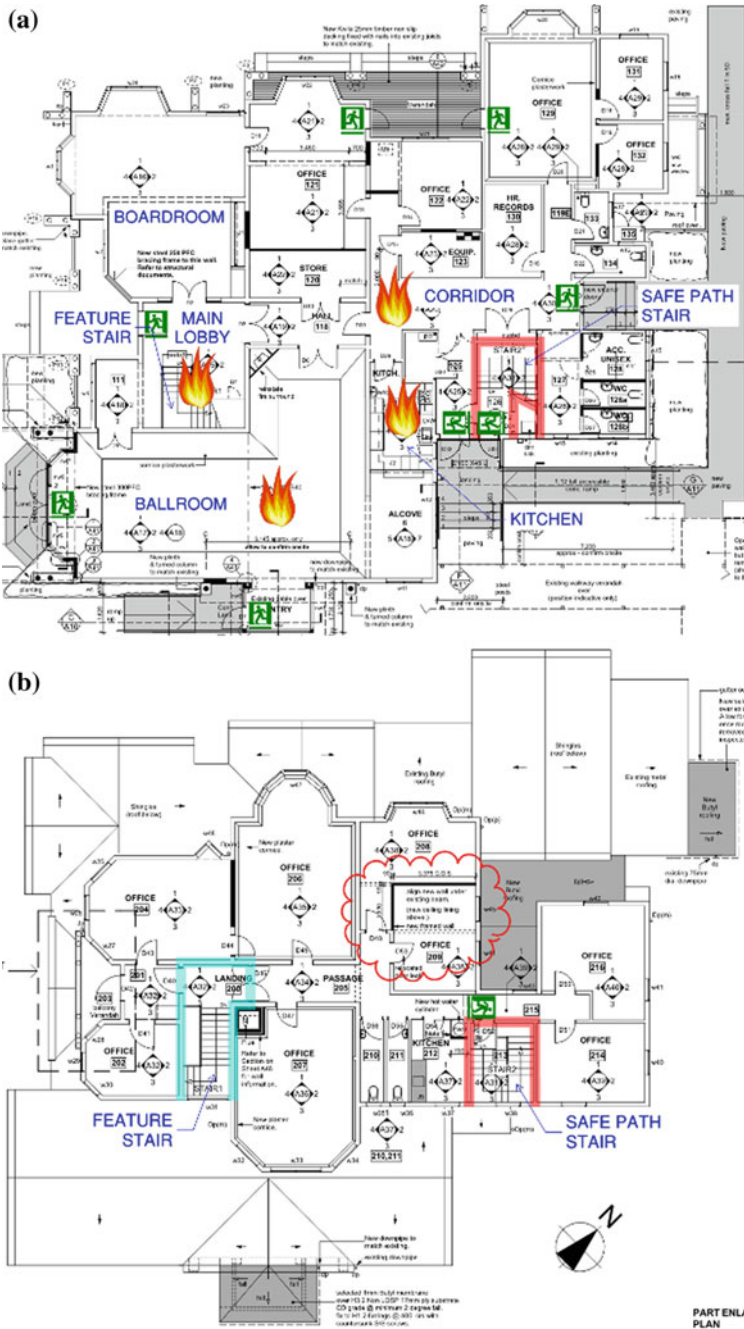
Floor plans of McDougall House, a ground floor layout, and b first floor layout showing the location of exits, the demarcation of fire and smoke separations and the location of design fires
